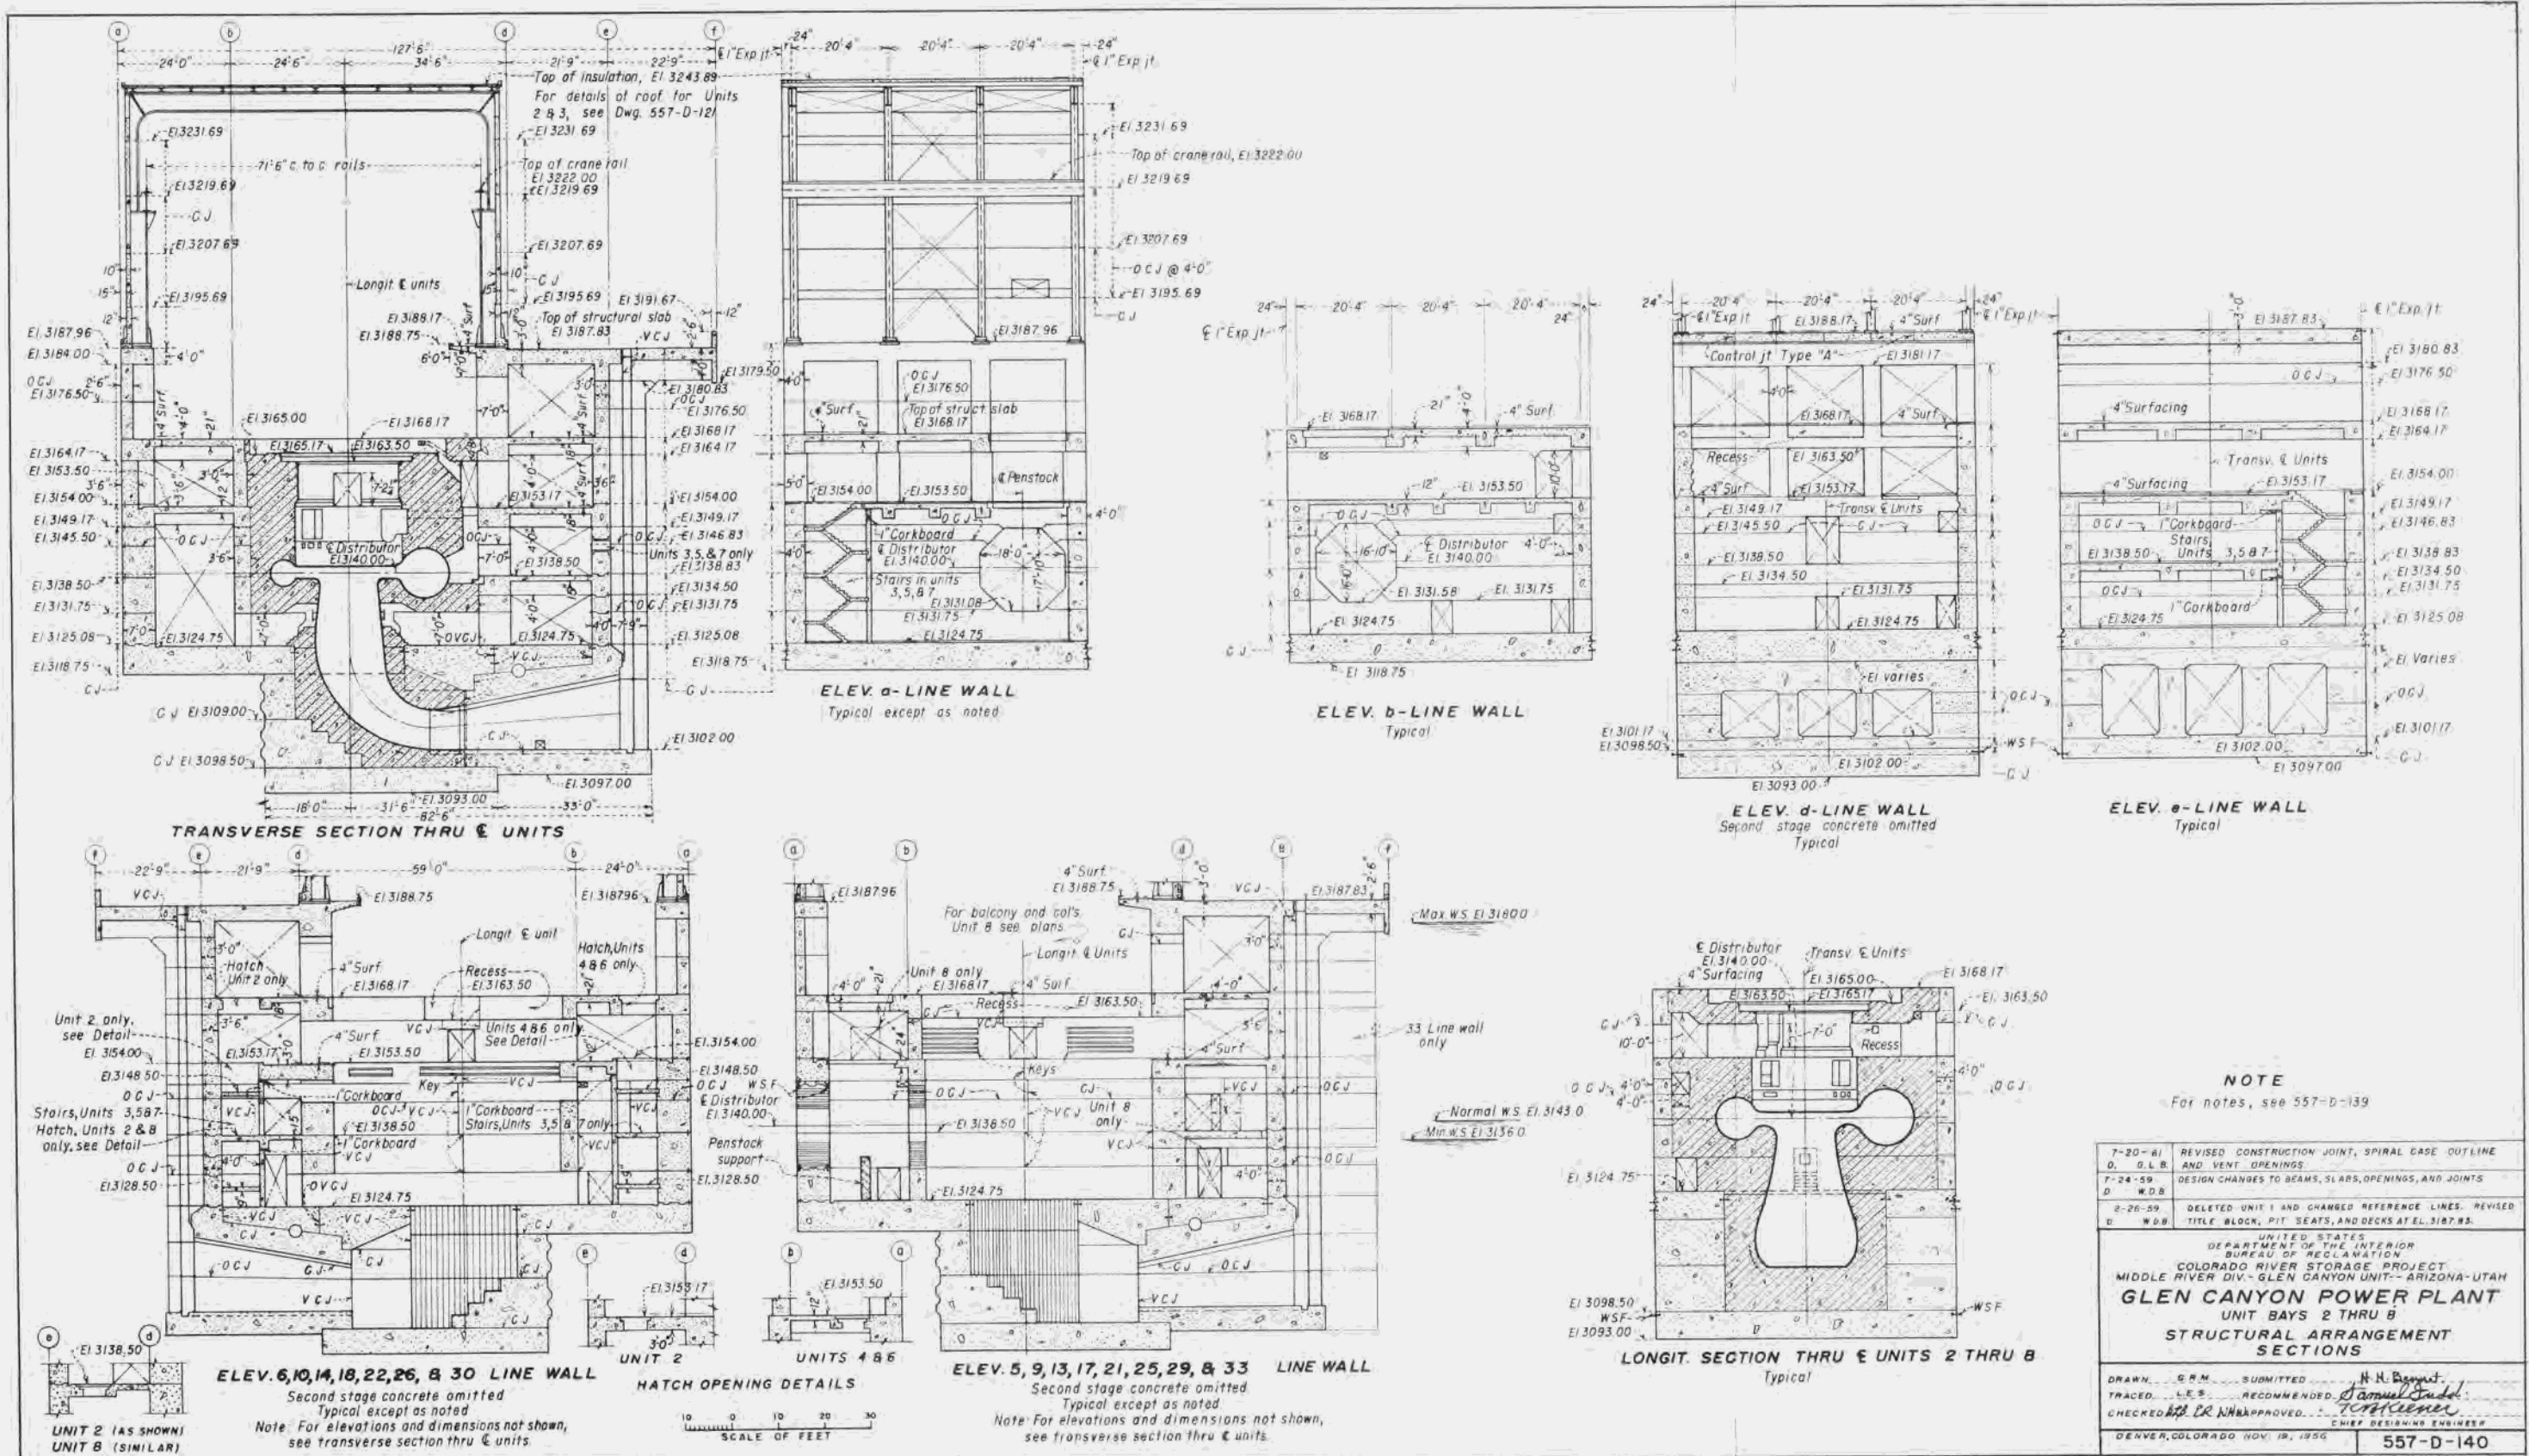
Powerplant structural arrangement plans—Unit bays 2 through 8.
